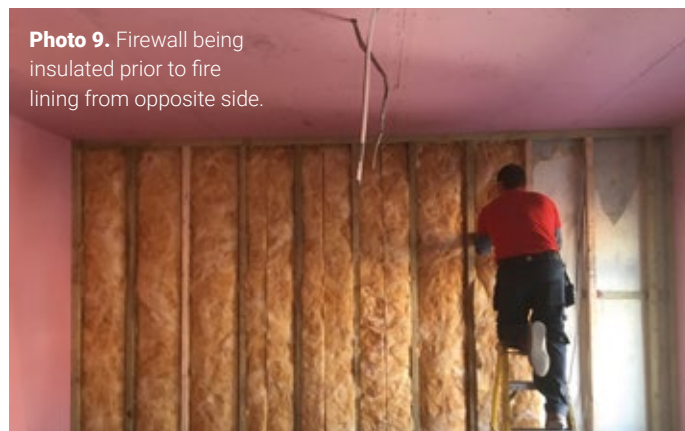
Firewall being insulated prior to fire lining from opposite side.
